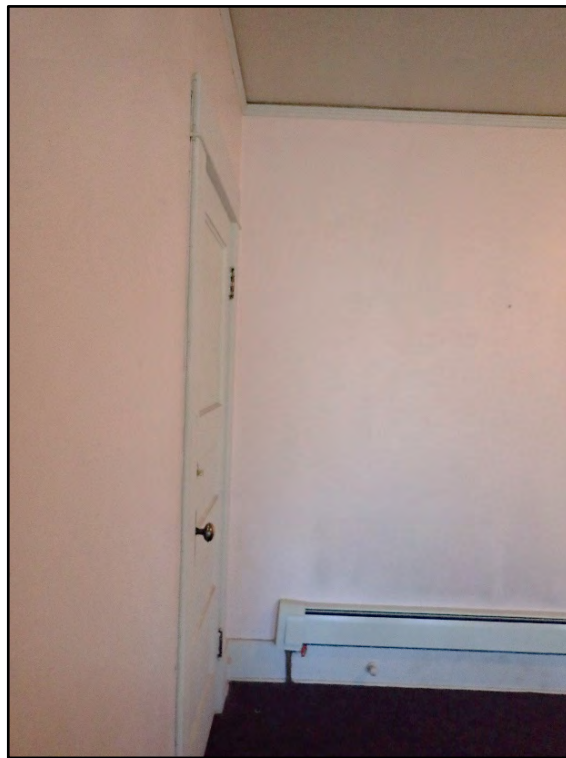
A look back toward the hall door (note the visible gap between the top of the walls and ceiling, which are separating due to age).
